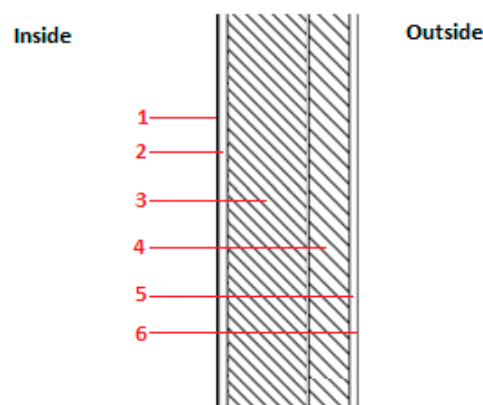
A cross-section of the external wall of the building in the plant in the present state (layers 1–6 described in text).
